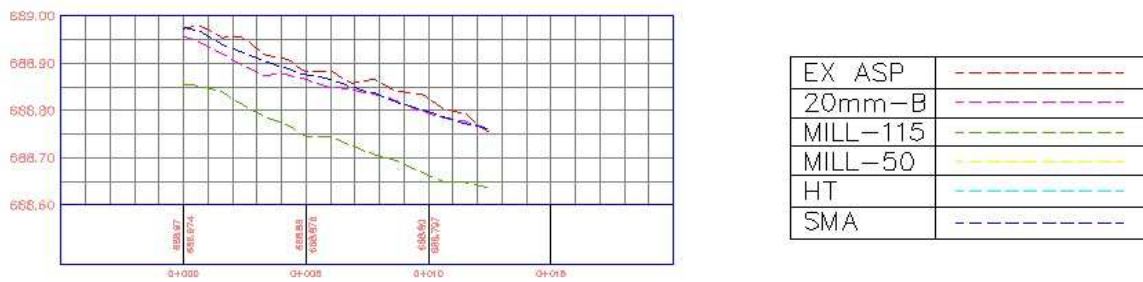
Cross section at Gate Avenue before stop bar [45]
